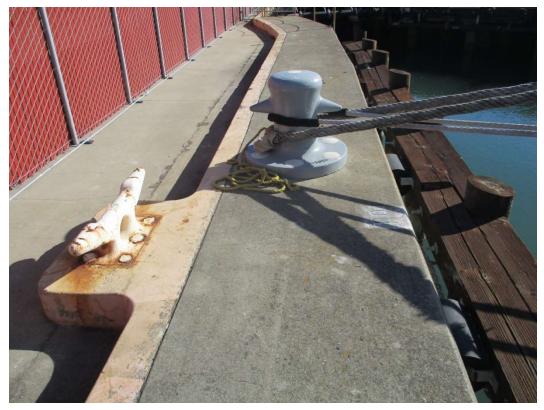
Typical condition curb and new mooring bollard at Pier 1
